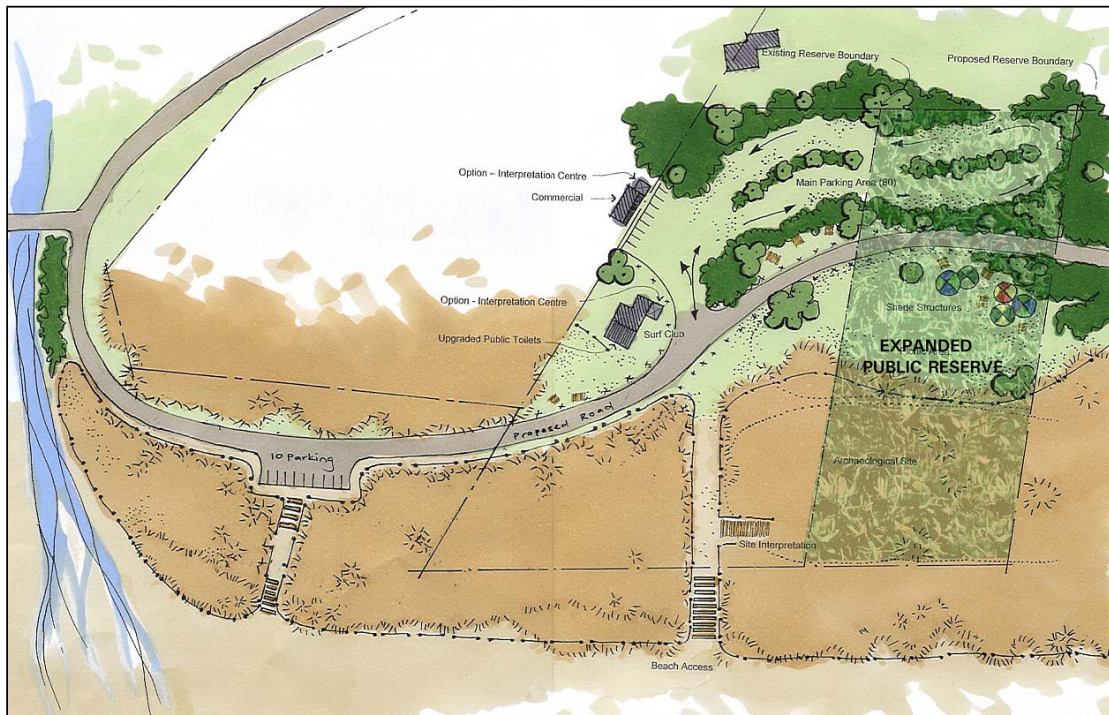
Layout Plan of Proposed HDC Reserve Extension
